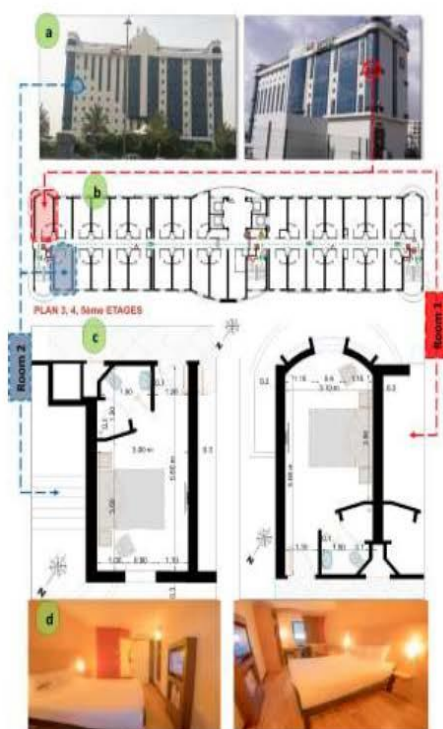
a. facades views of ibis hotel b. Floor plan view of hotel c. plan of investigated hotel rooms d. interior views of the rooms.
